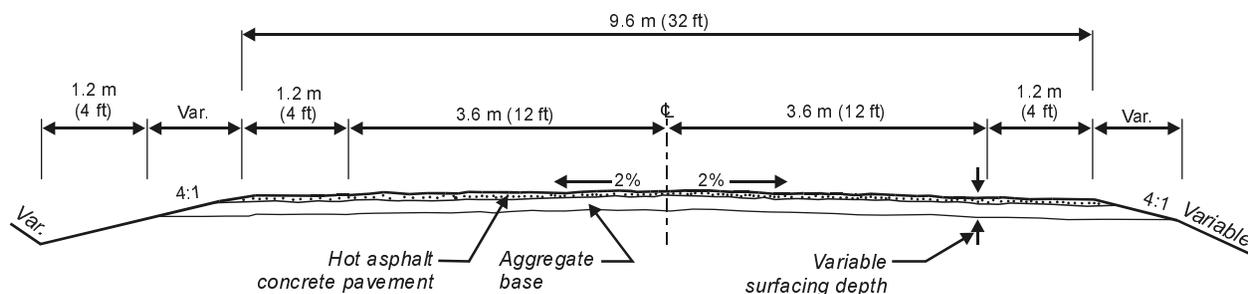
Typical cross section, 32-ft width alternative, MP 0.0 to MP 5.3.
